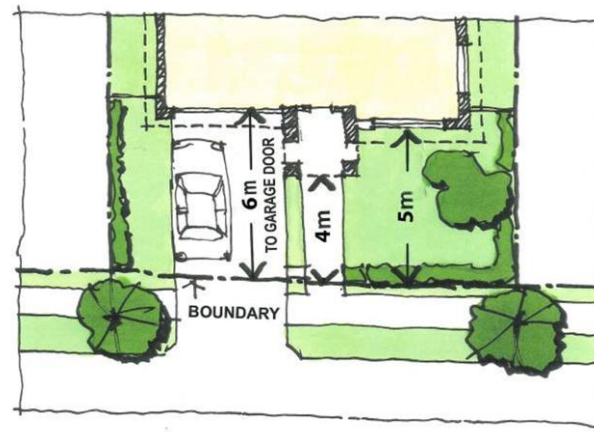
Example of front setback criteria showing 'translucent' element (porch) set forward of general setback and garage door set back behind general building line to reduce visual impact.
